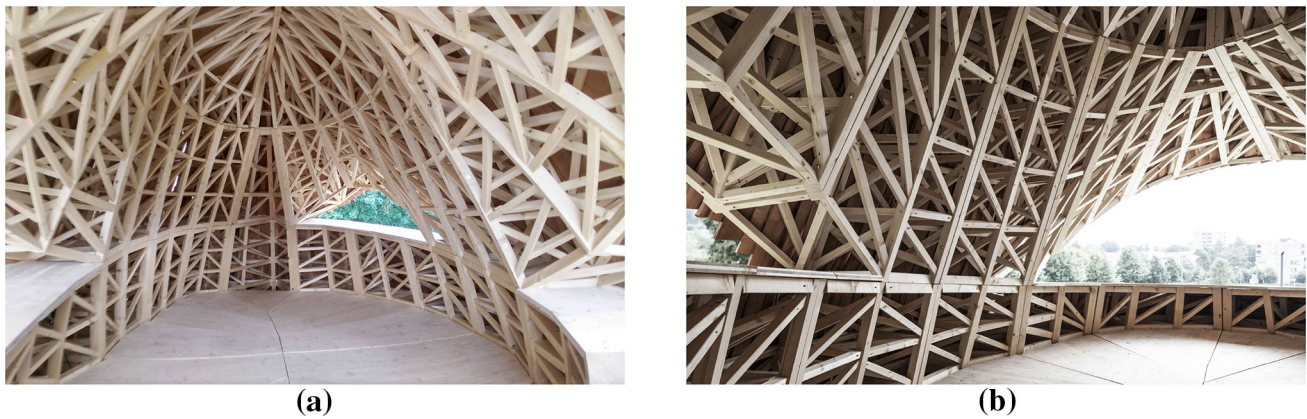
Interior images of final structure on the upper floor, showing seamless integration of balustrade, floor elements, walls, roof structure, and staircase (a). The size of the prefabricated chunks is still visible through the doubling of structural elements b image courtesy of Kasia Jackowska
